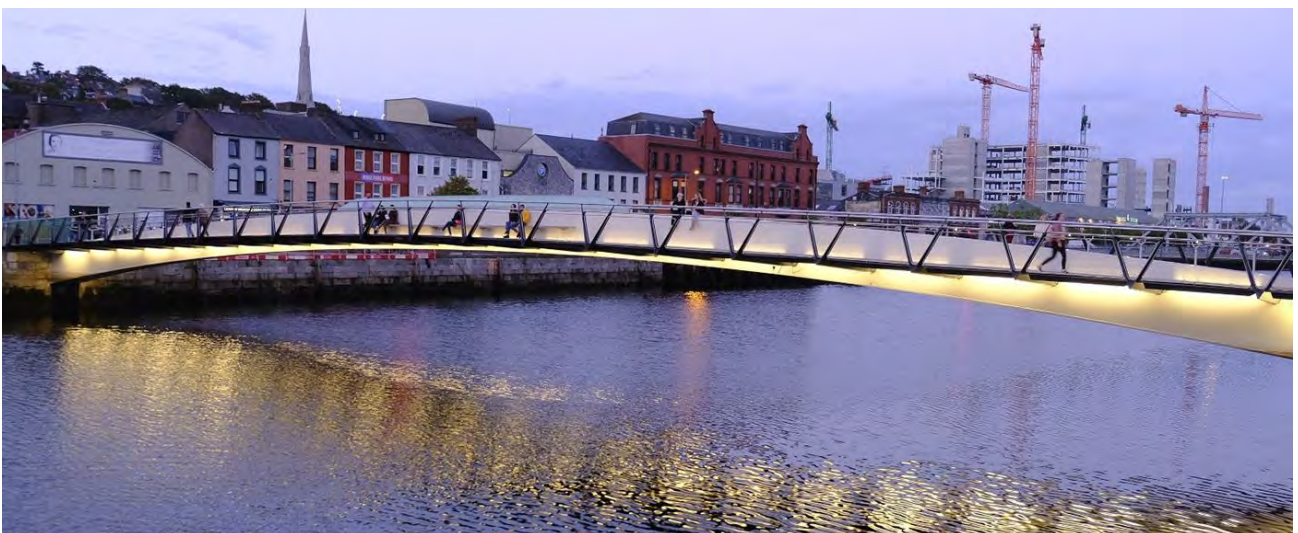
Bridge elevation during dusk with architectural lighting on.
